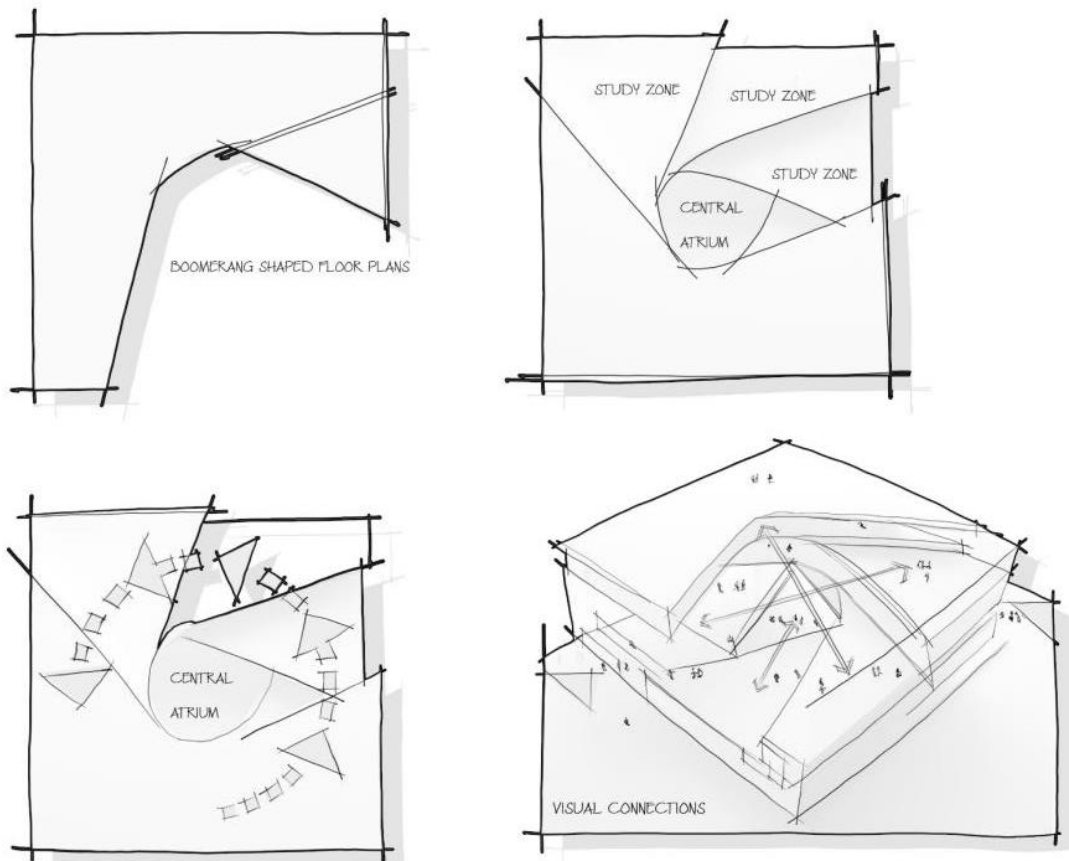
Boomerang Shaped Floor Plan (Adapted from 3xn.com)
